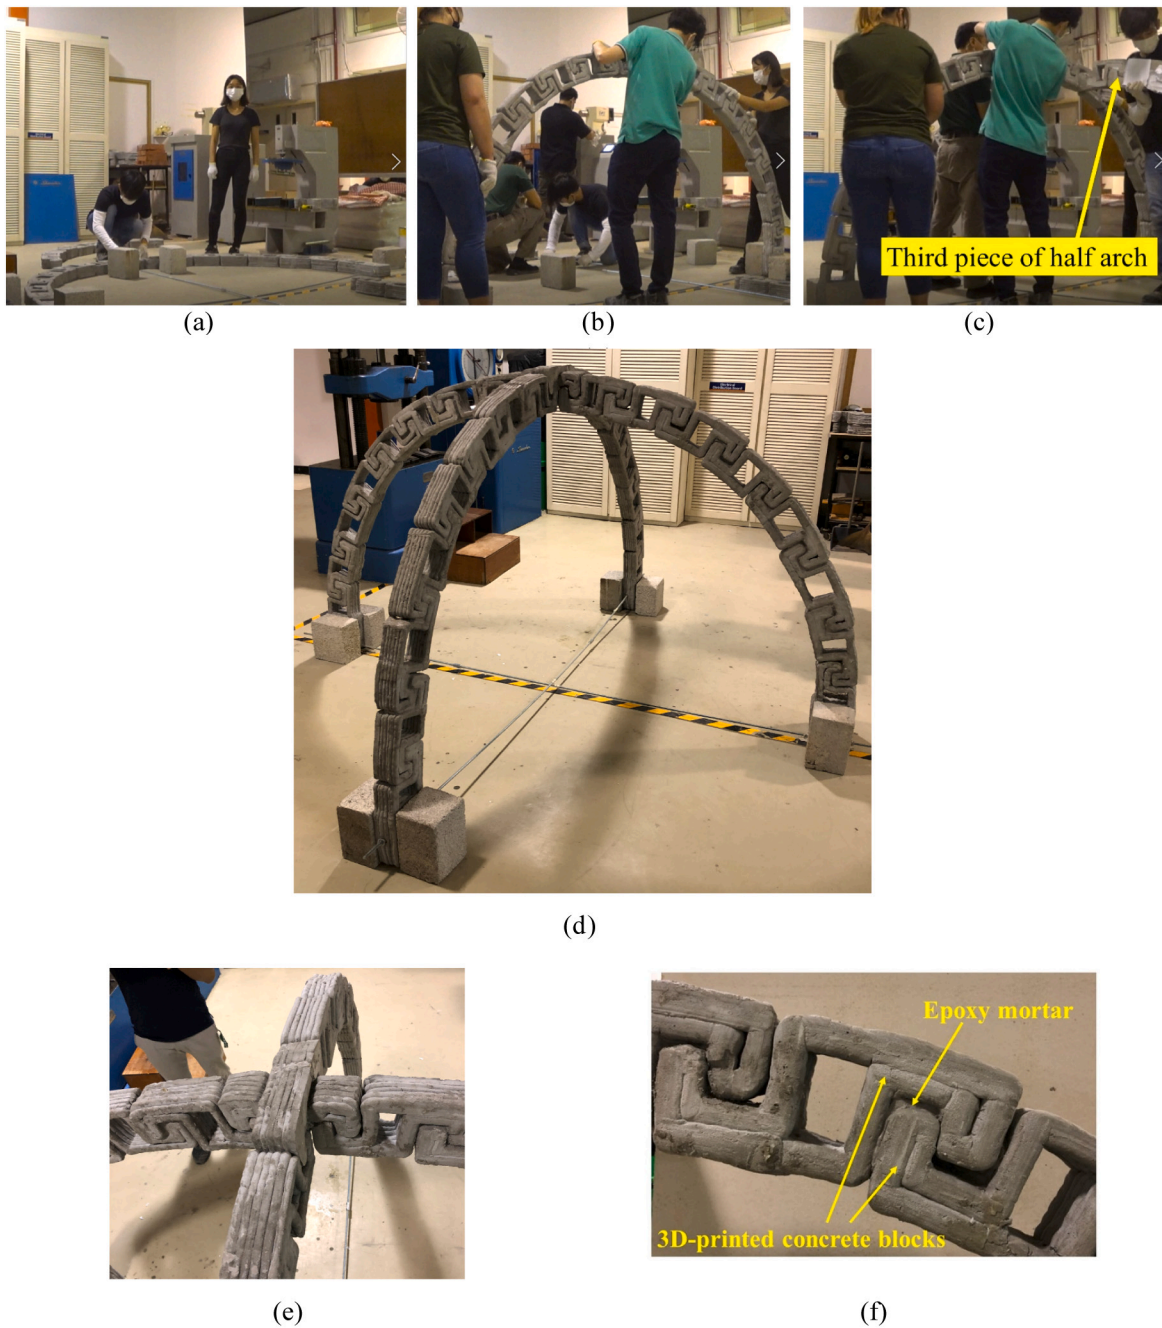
(a) Assembled half arch on ground; (b) Erected arch; (c) Installation of half arch; (d) Assembled concrete double arch; (e) Intersection of the two arches; (f) Interlock between adjacent concrete blocks.
